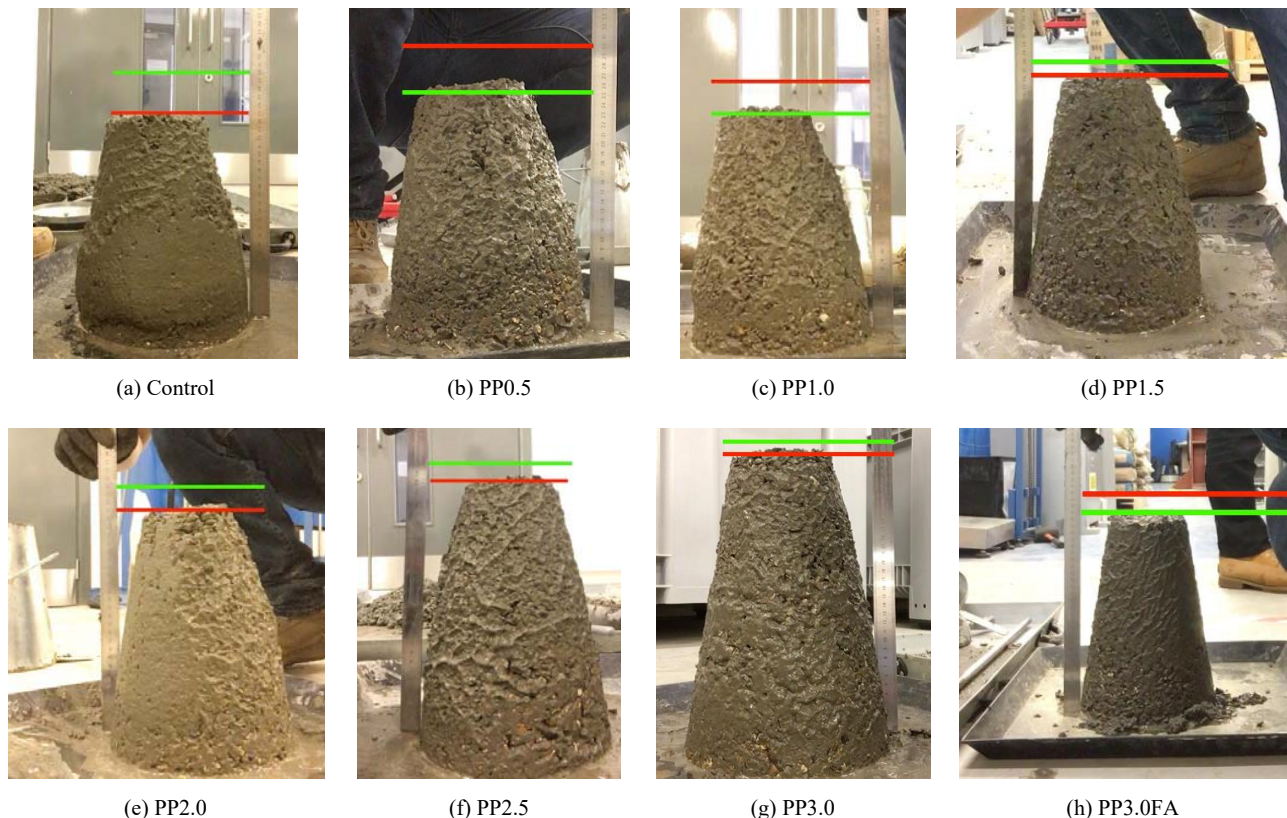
Workability of Concrete Mixes – Slump Test Photographs
